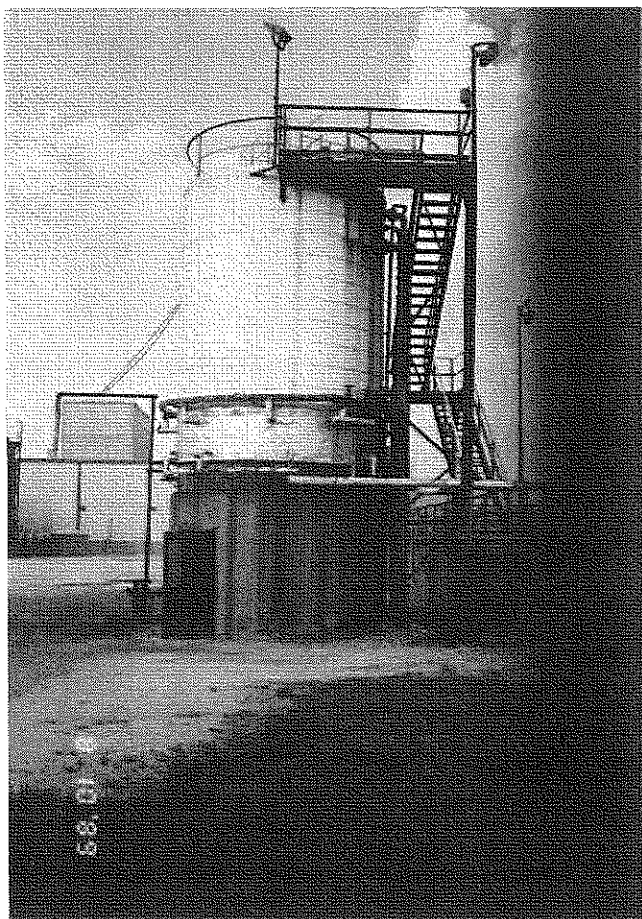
West view of Underground Injection Well (SWMU 43).
